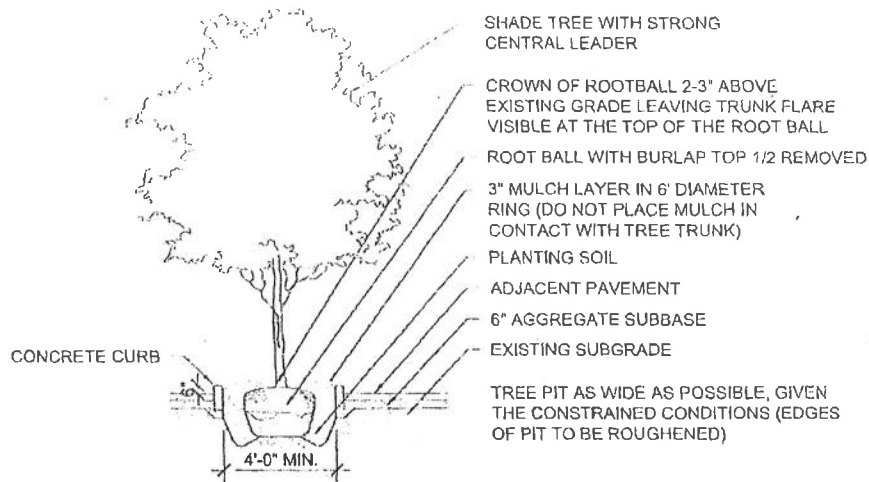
A: SITE AND LANDSCAPE PLAN
